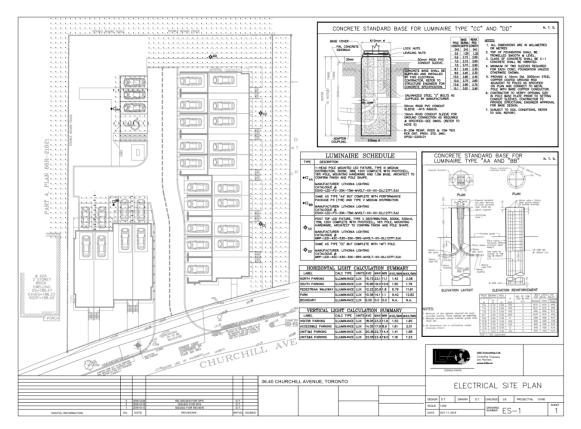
EXAMPLE OF LIGHTING PLAN
